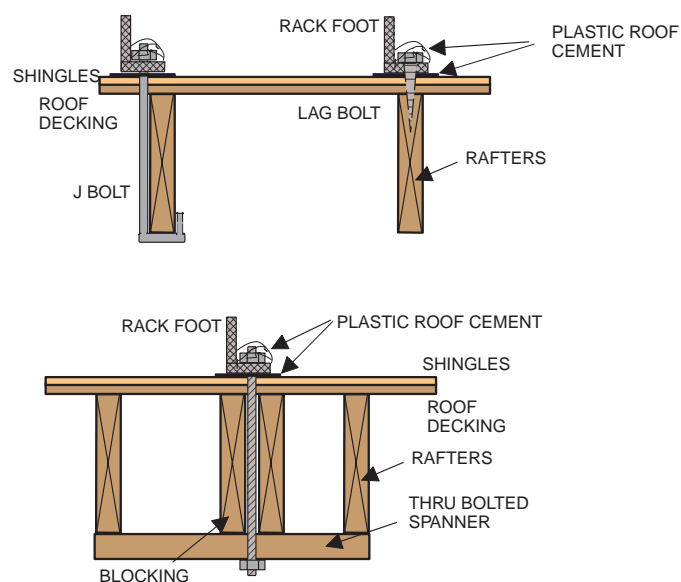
Details for spanner, lag screw, and J-bolt mounting.
